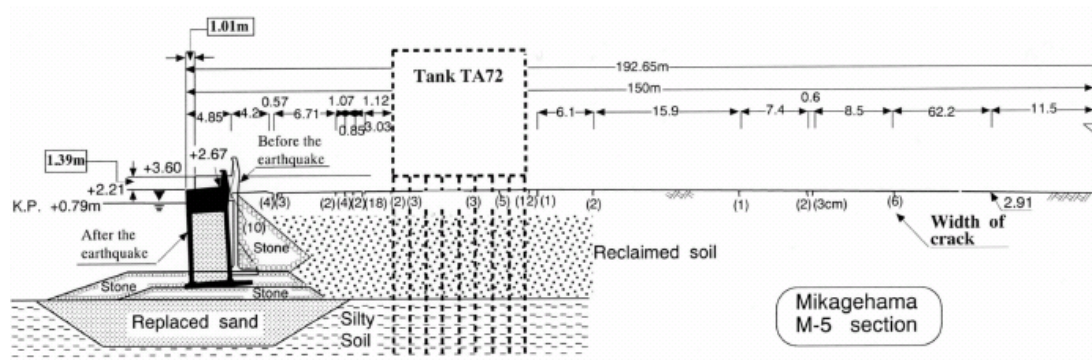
Detailed profile of the quay wall movement and ground distortion in the backfills at Section M-5
